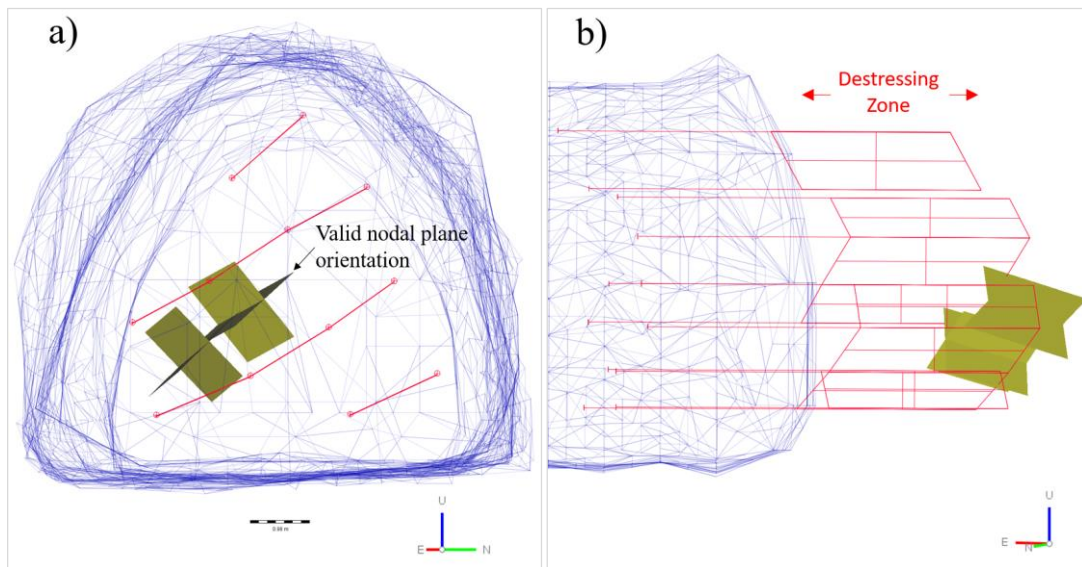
a) Transverse and b) longitudinal section views of mechanism nodal planes after Cut #16.
